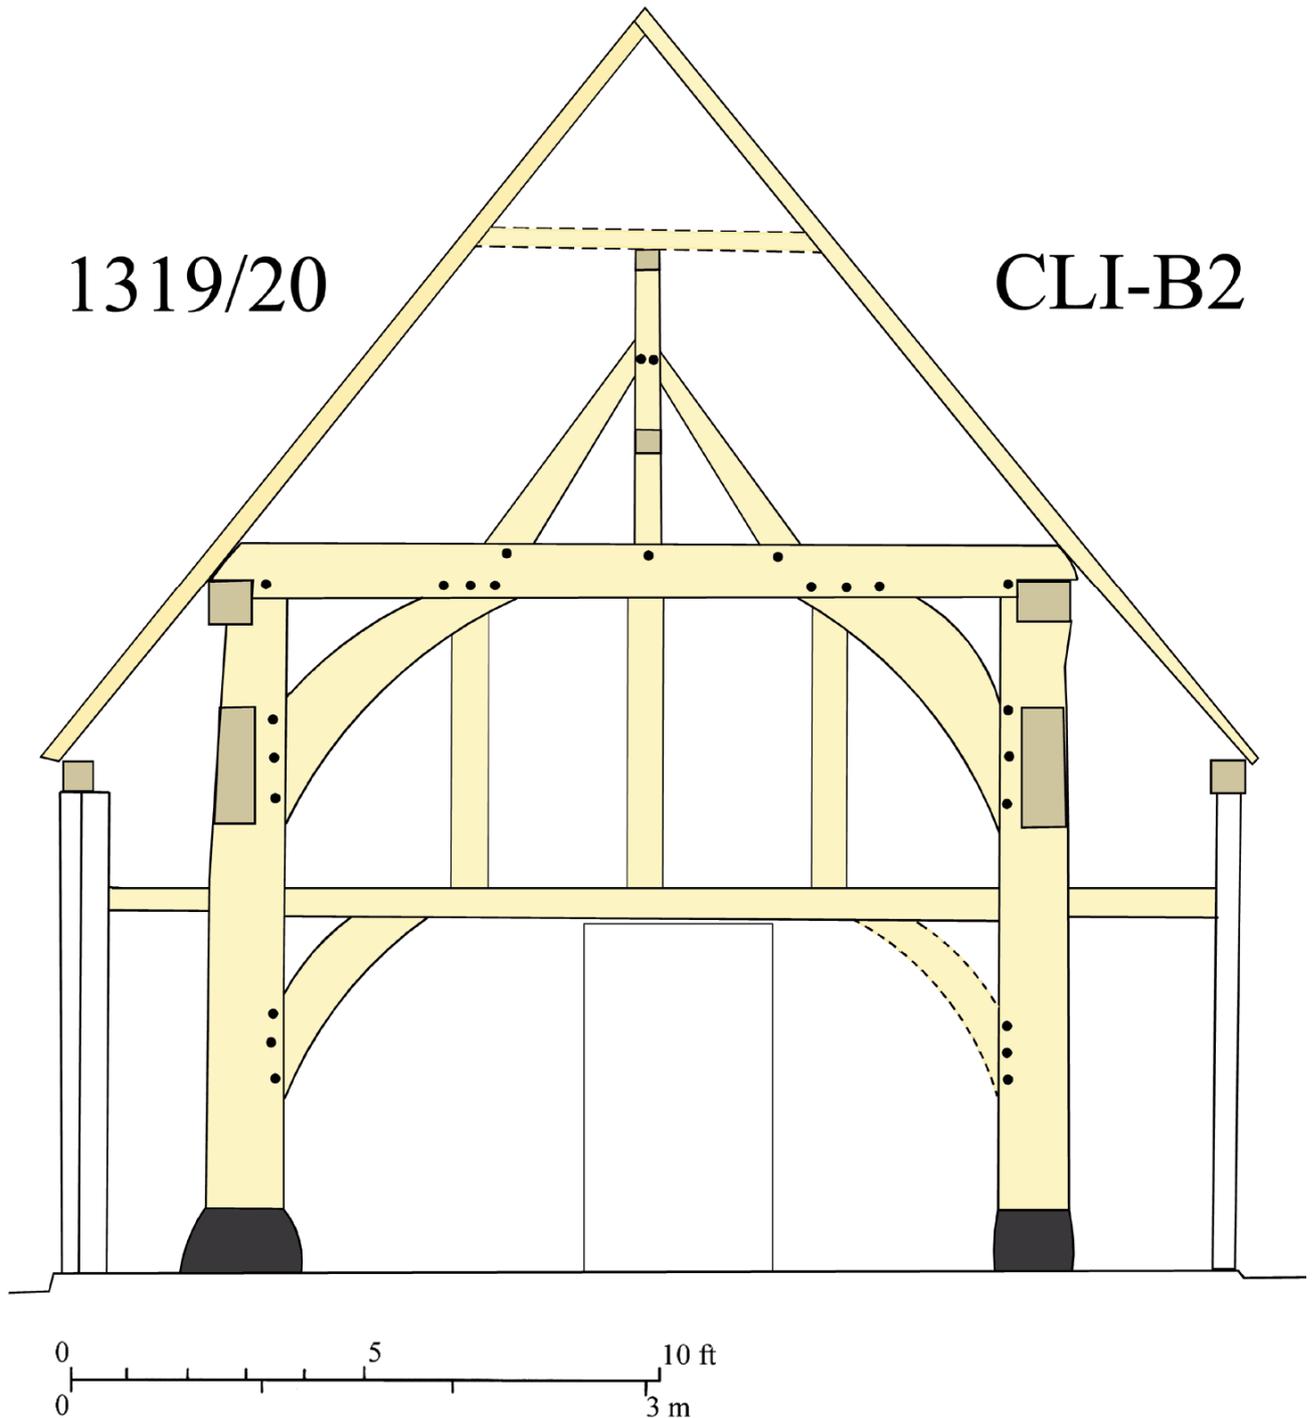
(b). Section of truss T2 from the east (from Barley (1961), re-drawn with addition details).
